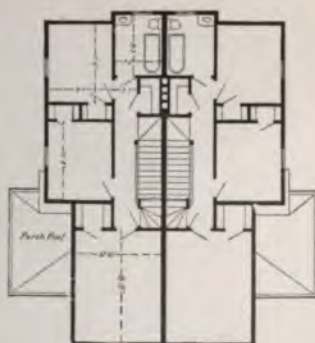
HOUSE FOR EMPLOYEES, PLAN S
